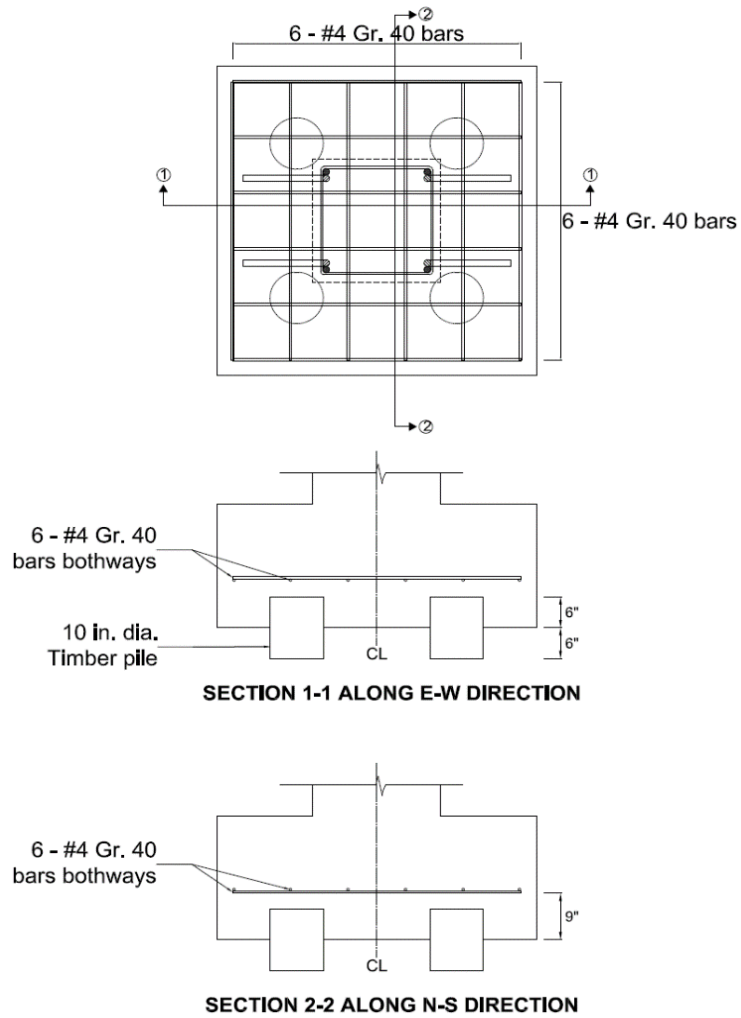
Footing reinforcing steel details for direct attachment to strong floor of diamond oriented column
